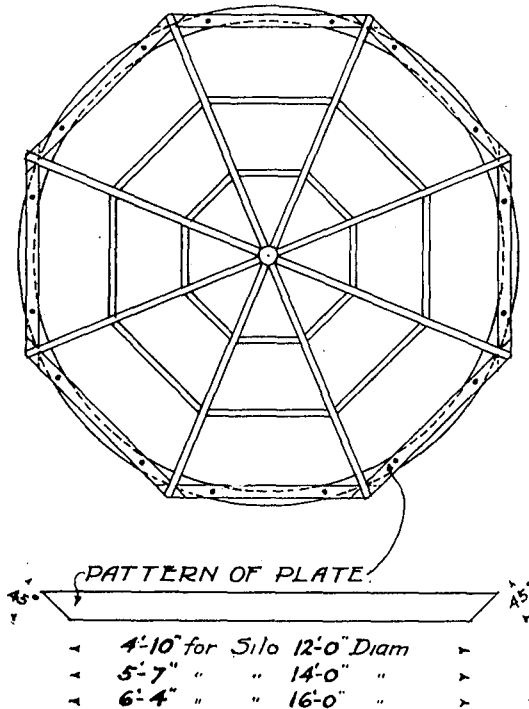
Method of Laying Out Octagonal Roof for Silo
